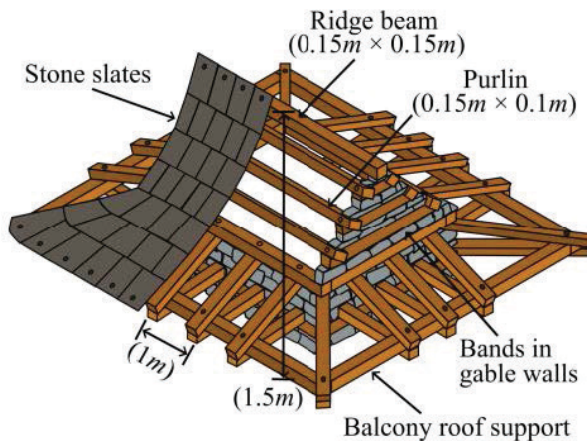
Typical sketch of the roof system in Kath-kunni buildings
